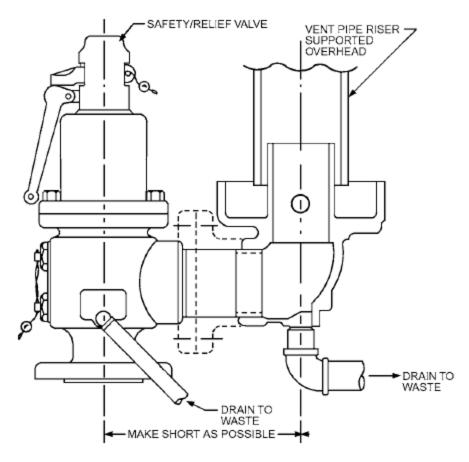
Safety/Relief Valve with Drip-Pan Elbow
